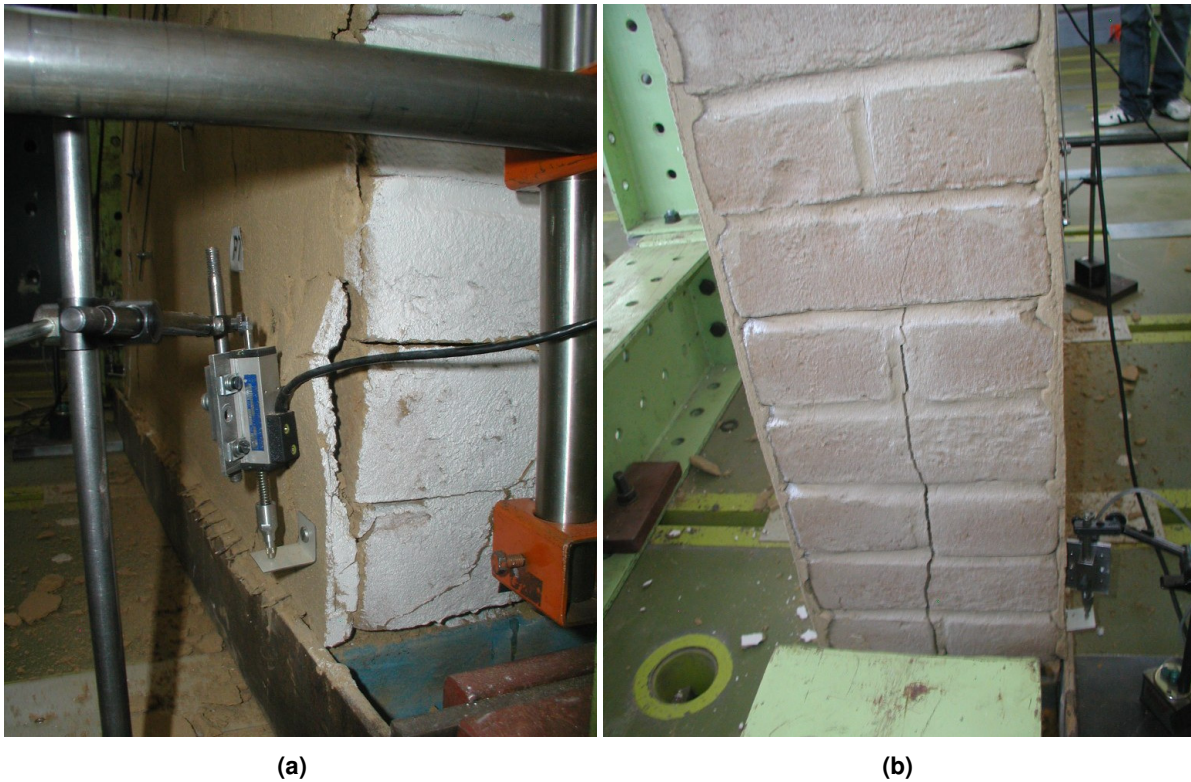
Damage at the base of the wall: detachment of the mortar layer (a) and large vertical crack in the wall thickness.
